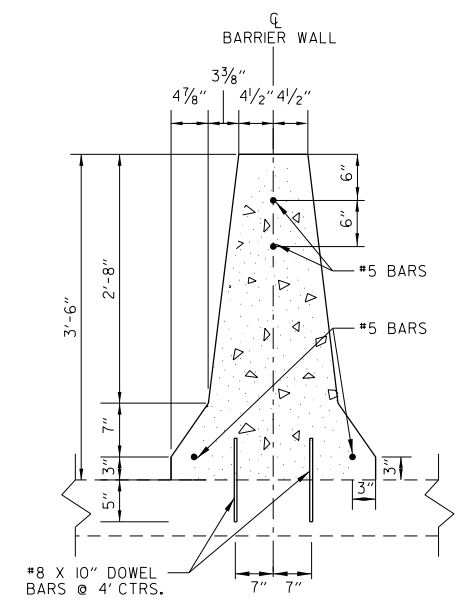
DETAIL FOR BARRIER WALL REPLACEMENT AND TRANSITION
